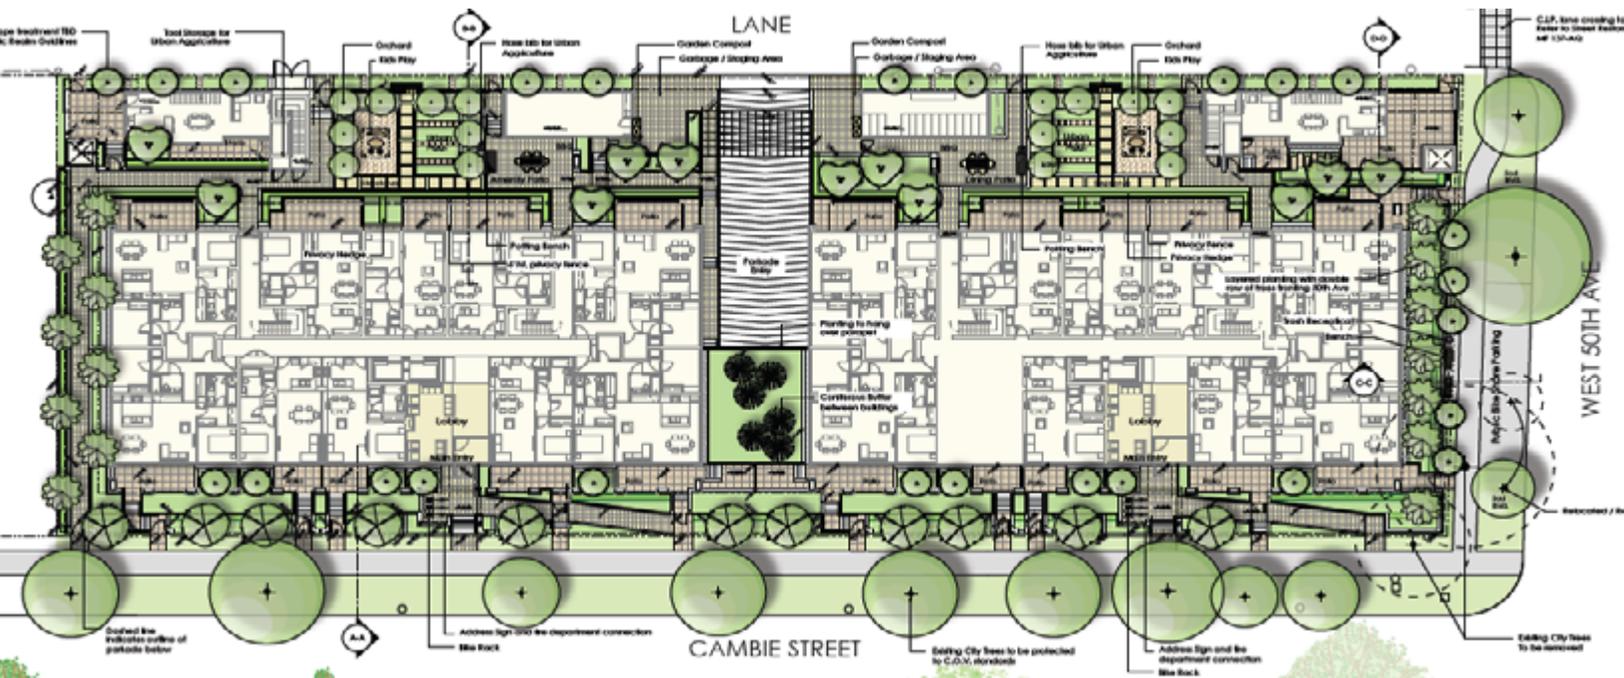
| A continuous garden wall runs along the laneway edge, linking laneway structures and providing views into the courtyard
